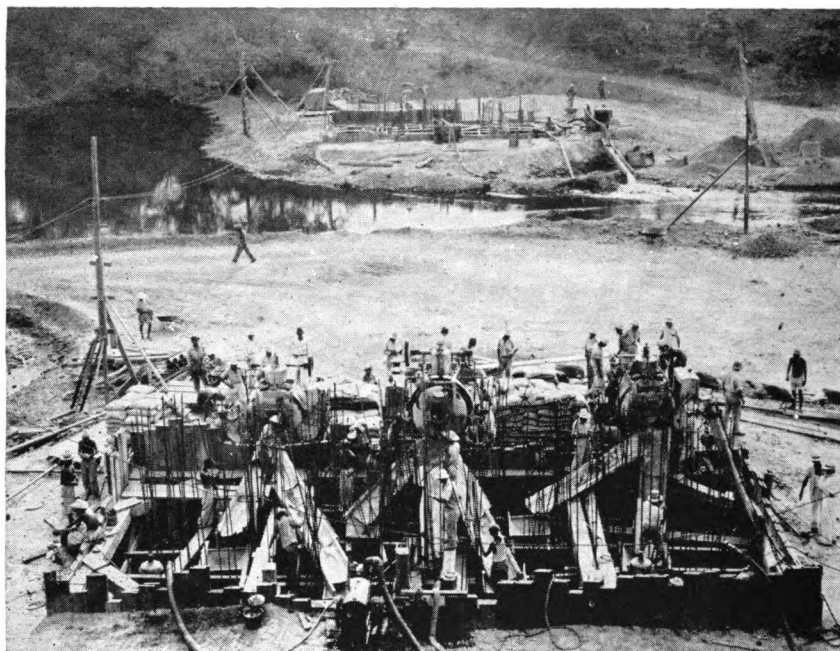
Dewatering bridge-pier site by pumping. Rio Grande de San Miguel, El Salvador.
